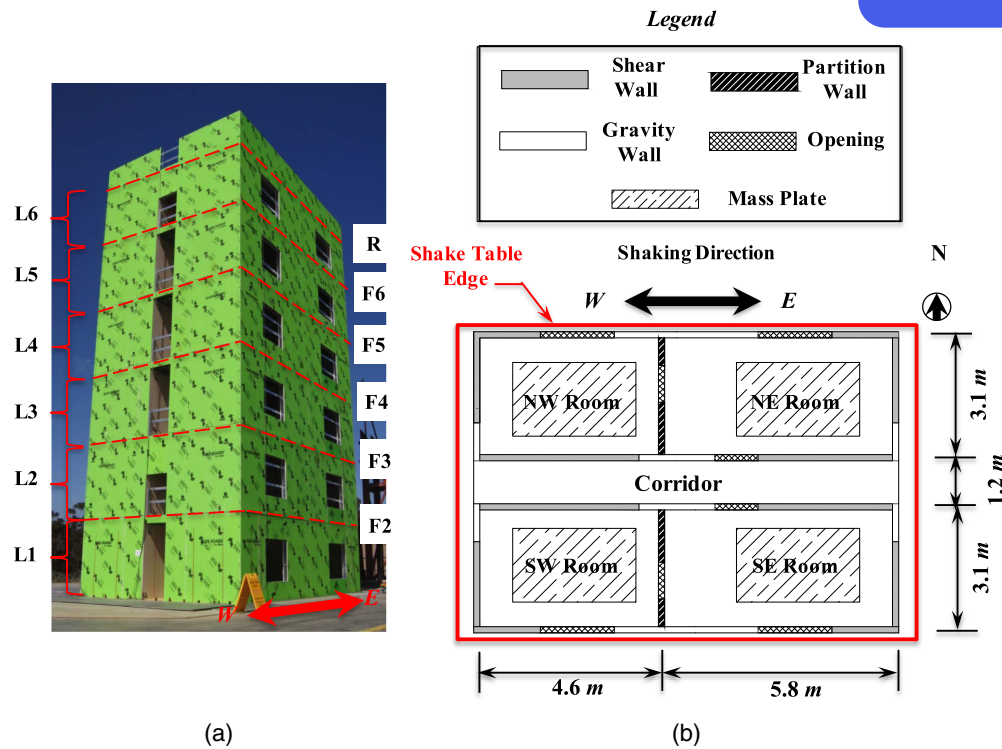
Test building: (a) isometric view (arrows denote earthquake shaking direction); and (b) building plan layout (typical of floors 2–6; hatched boxed areas denote mass plates).
